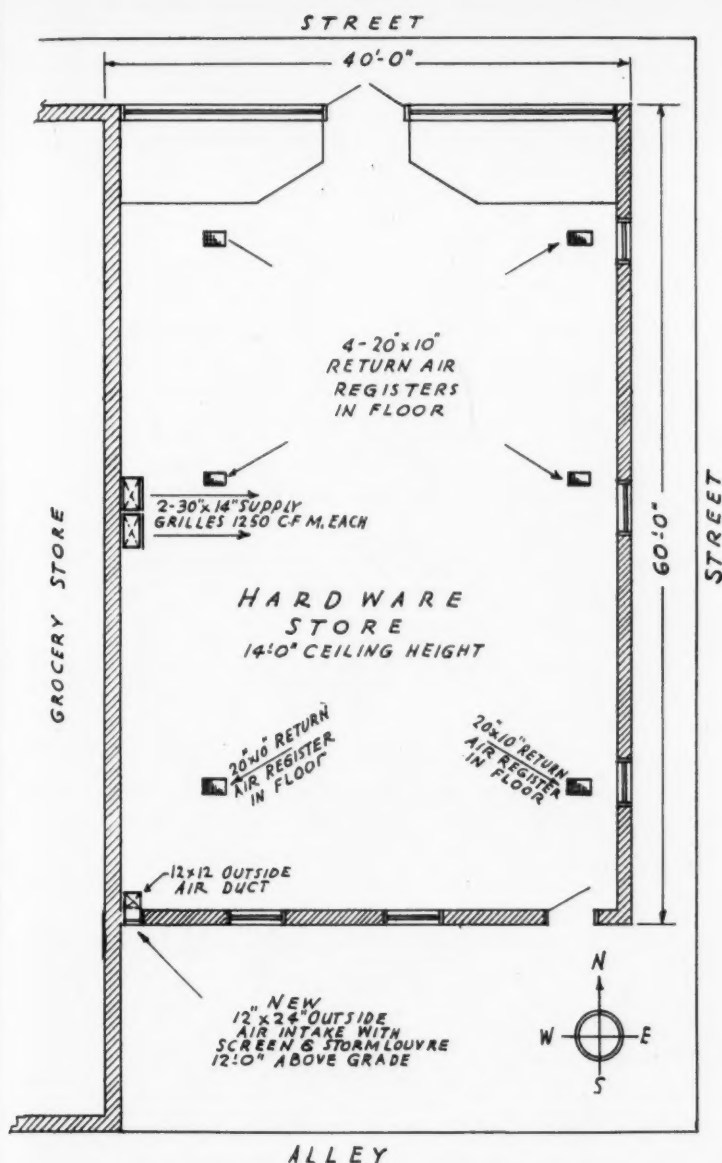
First floor plan showing floor returns and two side wall air supplies originally used for heating and now used for cooling also.
